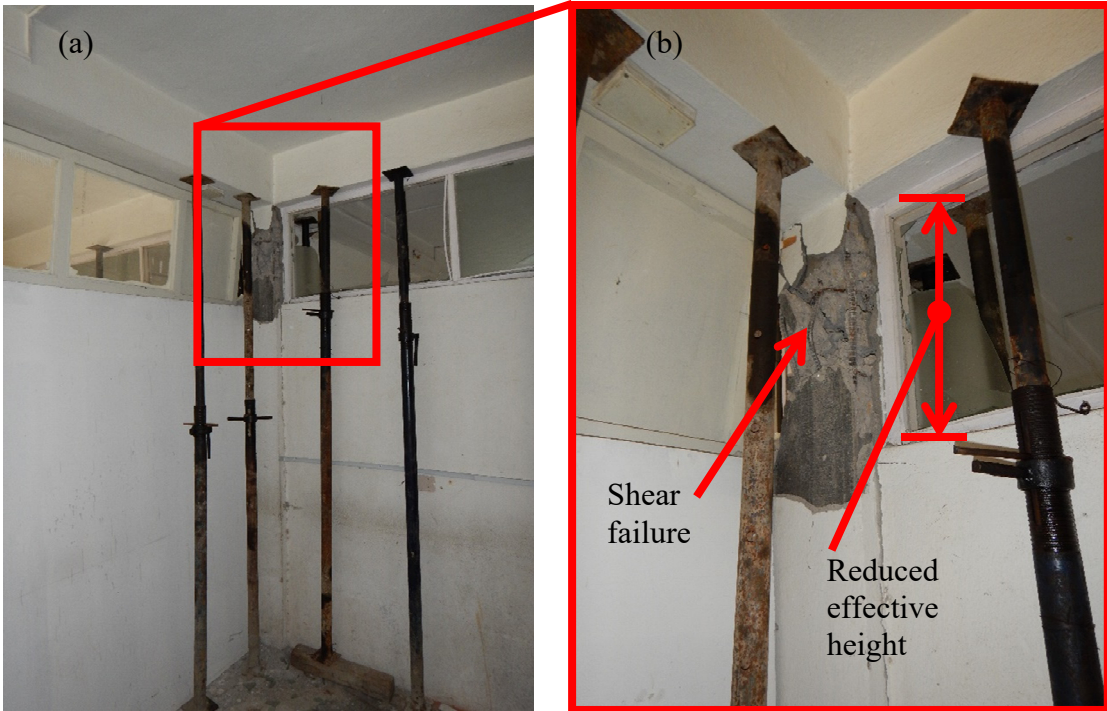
Kathmandu Engineering College Block C Building – short column shear failure: (a) overall view; (b) detail view.
